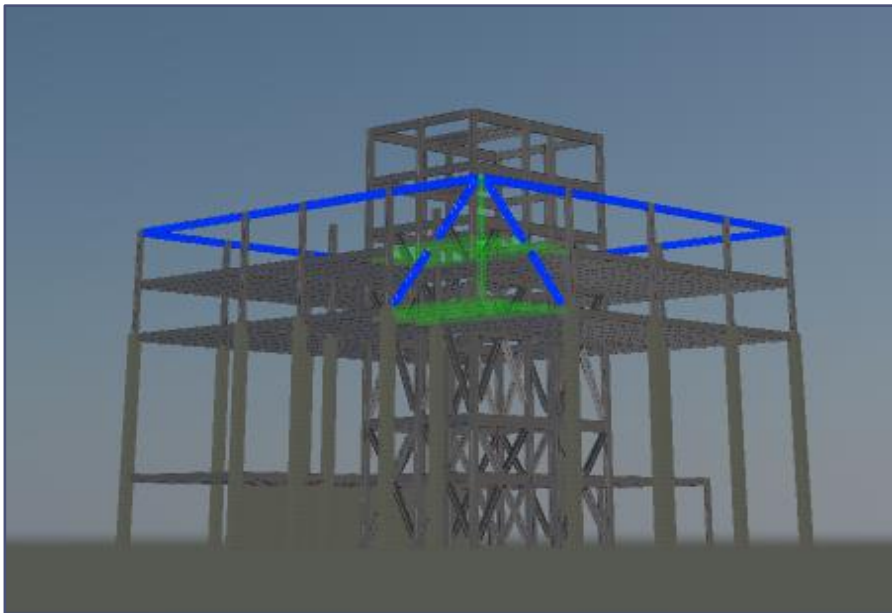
Figure L: Erect of Cross Bracing and Level 5 and 6 Fill In
